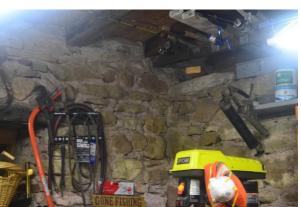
Looking south inside the garage (Town of Halton Hills 2021)
